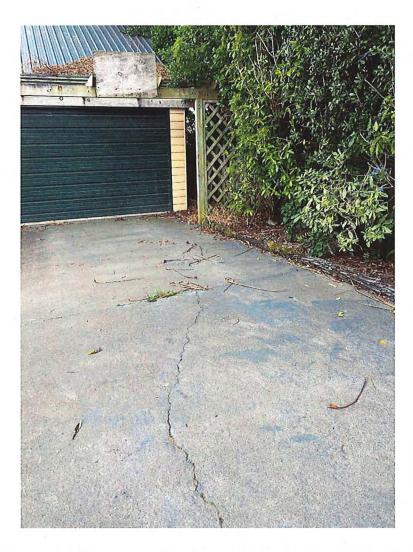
28 Pines Court – Garage and driveway into garage from Pines Court (Note: Damage to driveway from root system of 'Tree 6'
